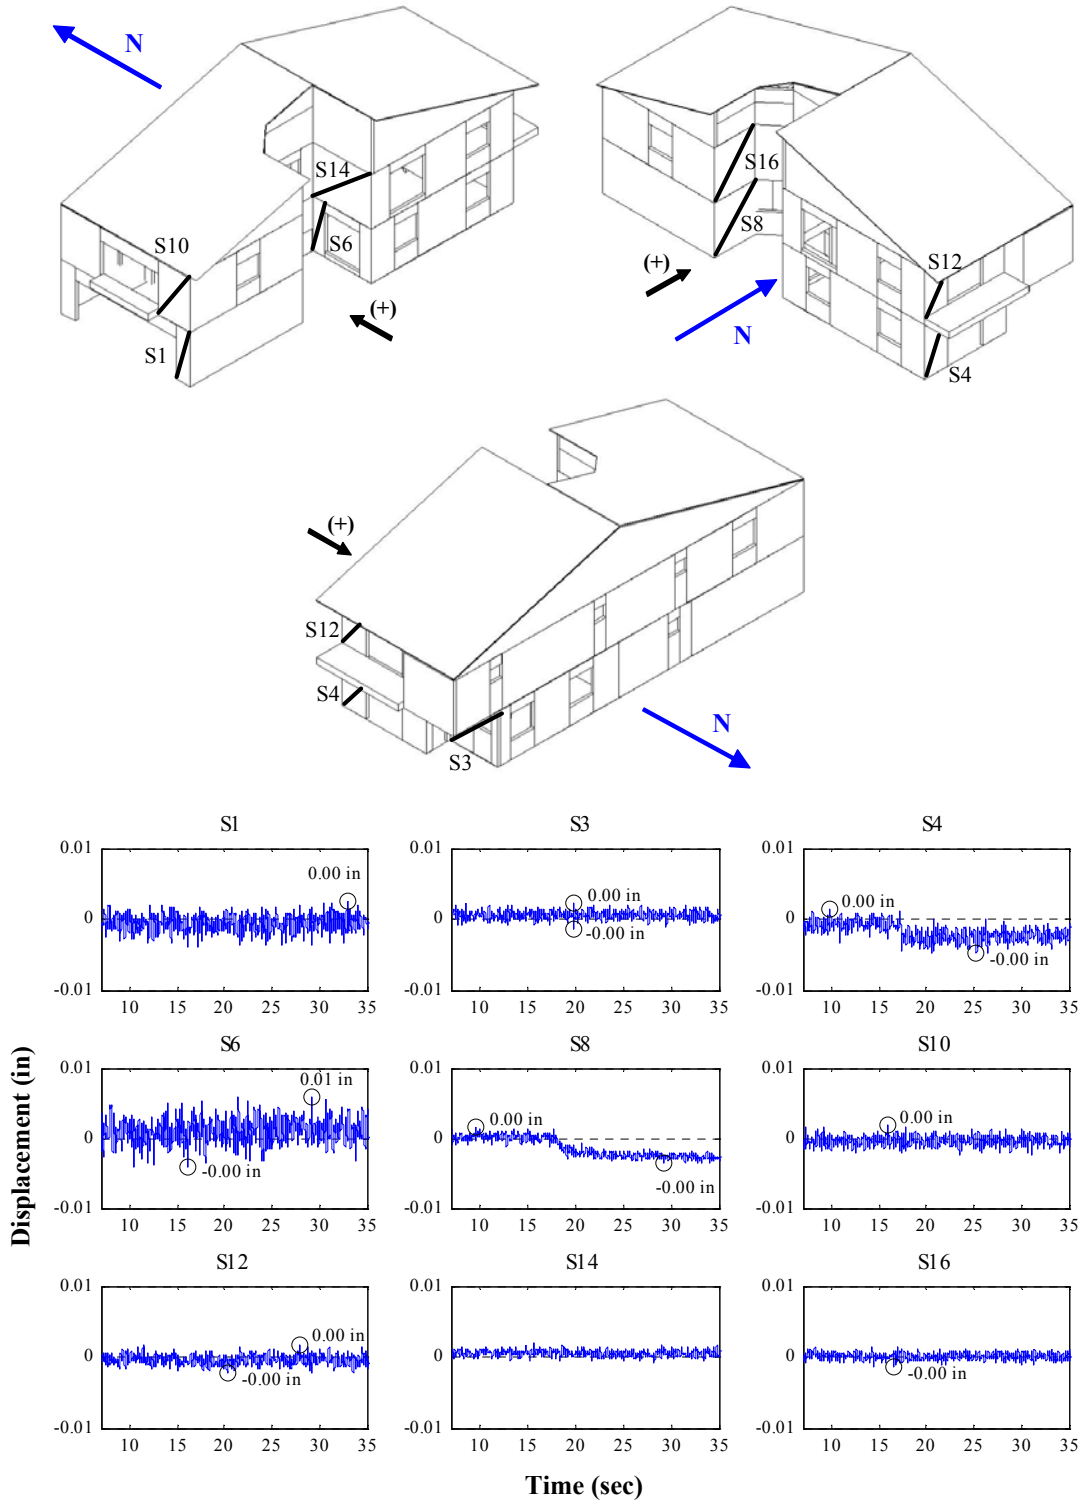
Wall deformations of north-south external walls for Test NWP3S01
